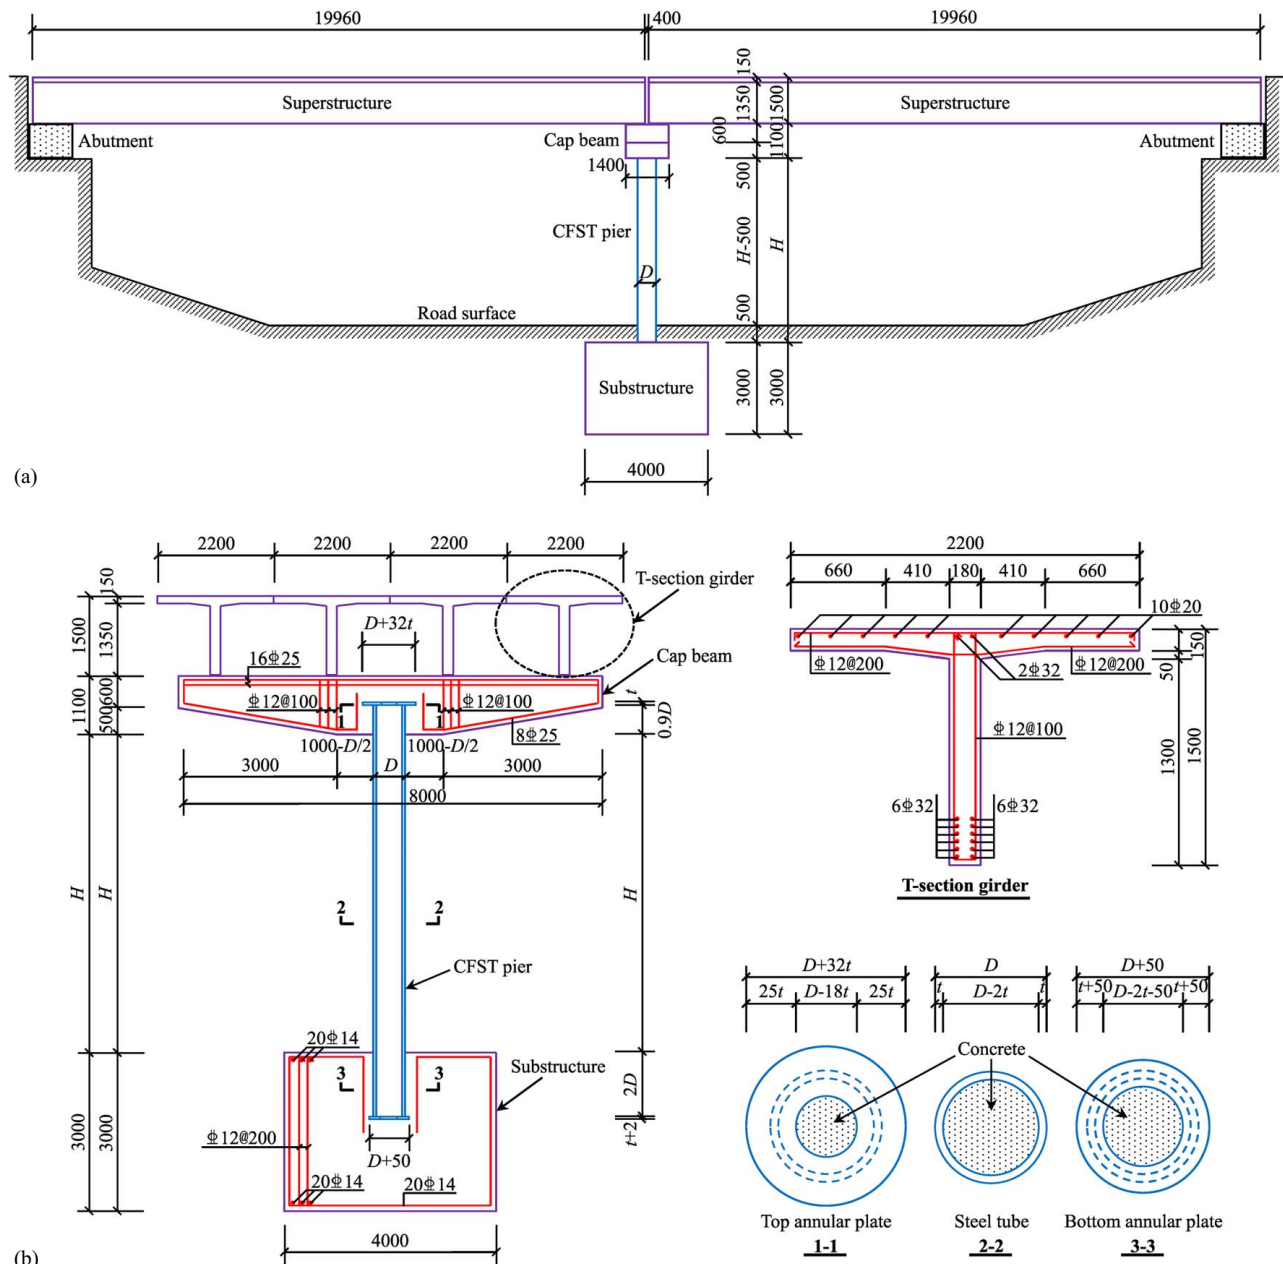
Structural drawings of a bridge specimen (in mm): (a) elevation view; and (b) cross sections.
